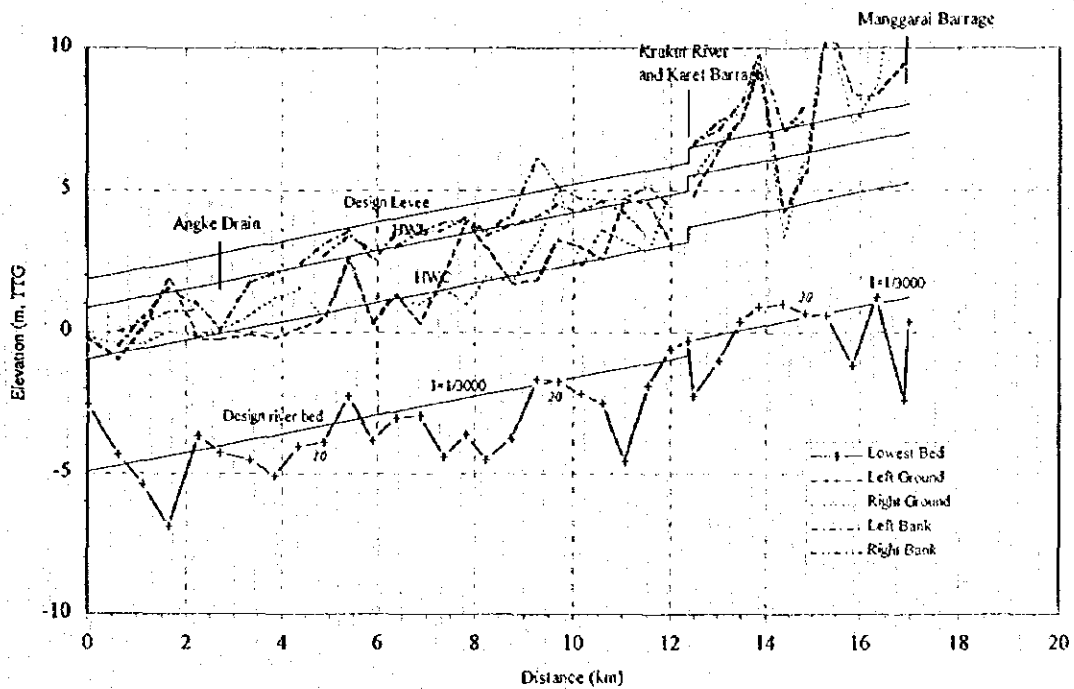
PROPOSED LONGITUDINAL PROFILE AND CROSS SECTION (8/13)
